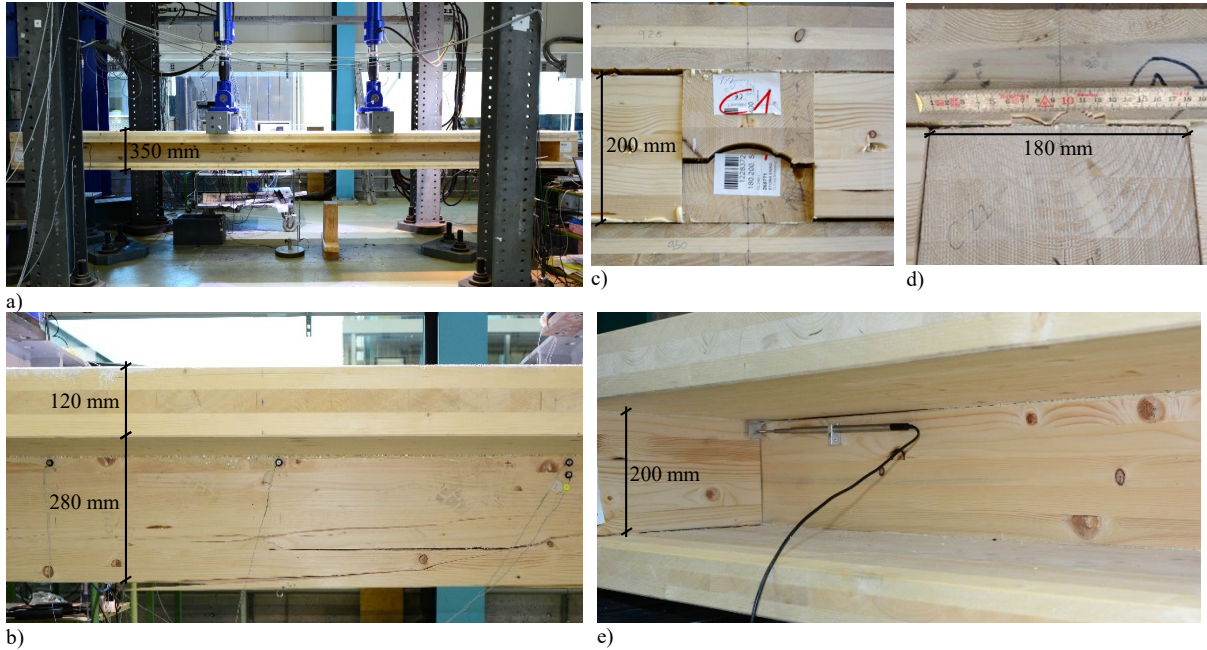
Reference tests - a) Front view of test specimen in the test setup (test specimen C1); b) Front view of tensile bending failure at the bottom of the rib at midspan (test specimen A2); c) Side view of shear failure in 2/5 rib height at the right / fixed support (test specimen C1); d) Front view + e) Side view of shear failure in the top glue line at the left / loose support (test specimen C2).
